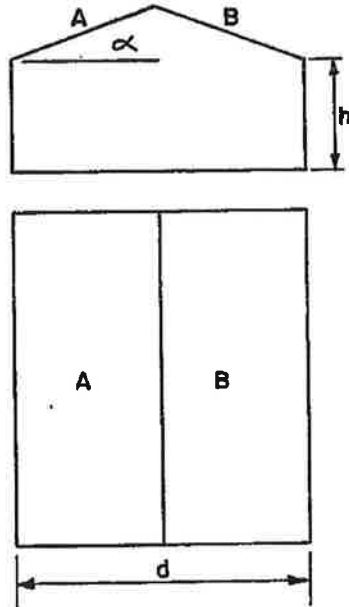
PITCHED ROOFS OF CLAD BUILDINGS: NOTATION
